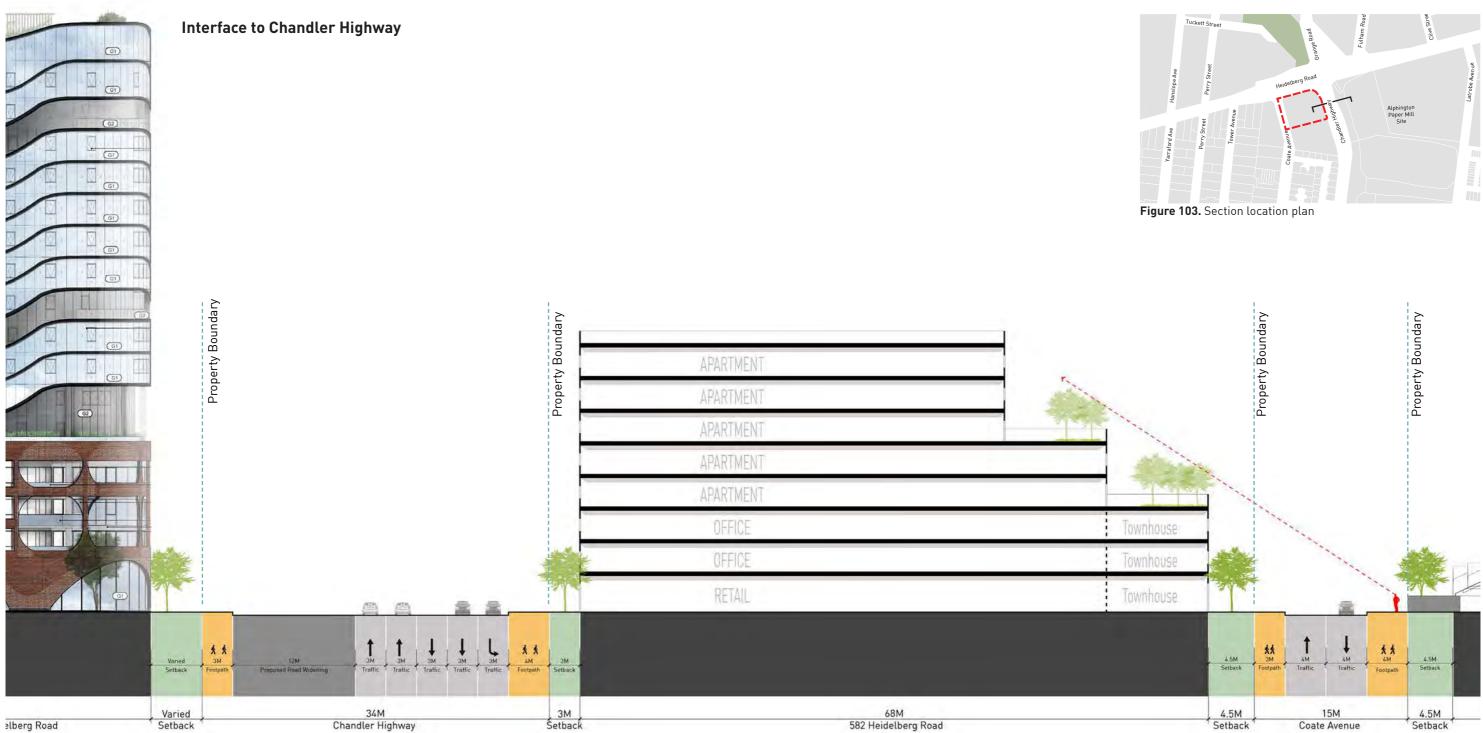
Proposed street section - full street section with indicative floor levels illustrated within this envelope for reference only. These are not intended to illustrate acceptable building designs.
